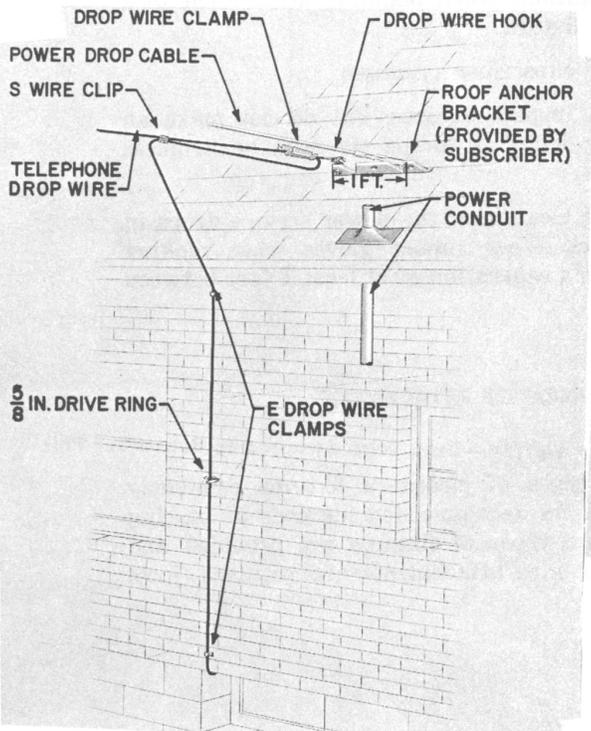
Drop Wire and Power Cable Attached to Roof Anchor Bracket
